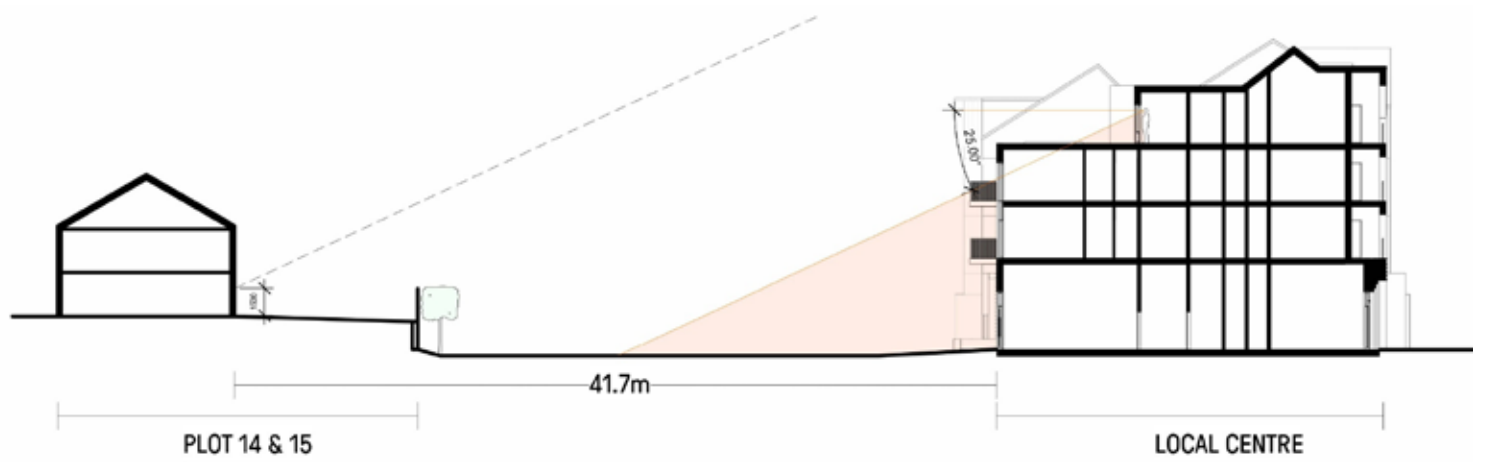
Local Centre & Plot 14 & 15 Third Floor Privacy Section prepared for Design Workshop
